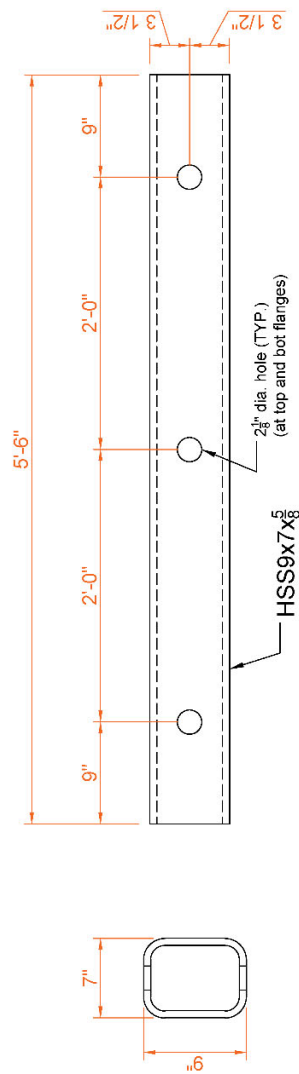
Cantilever Column Bottom End Details (DWG S23)
